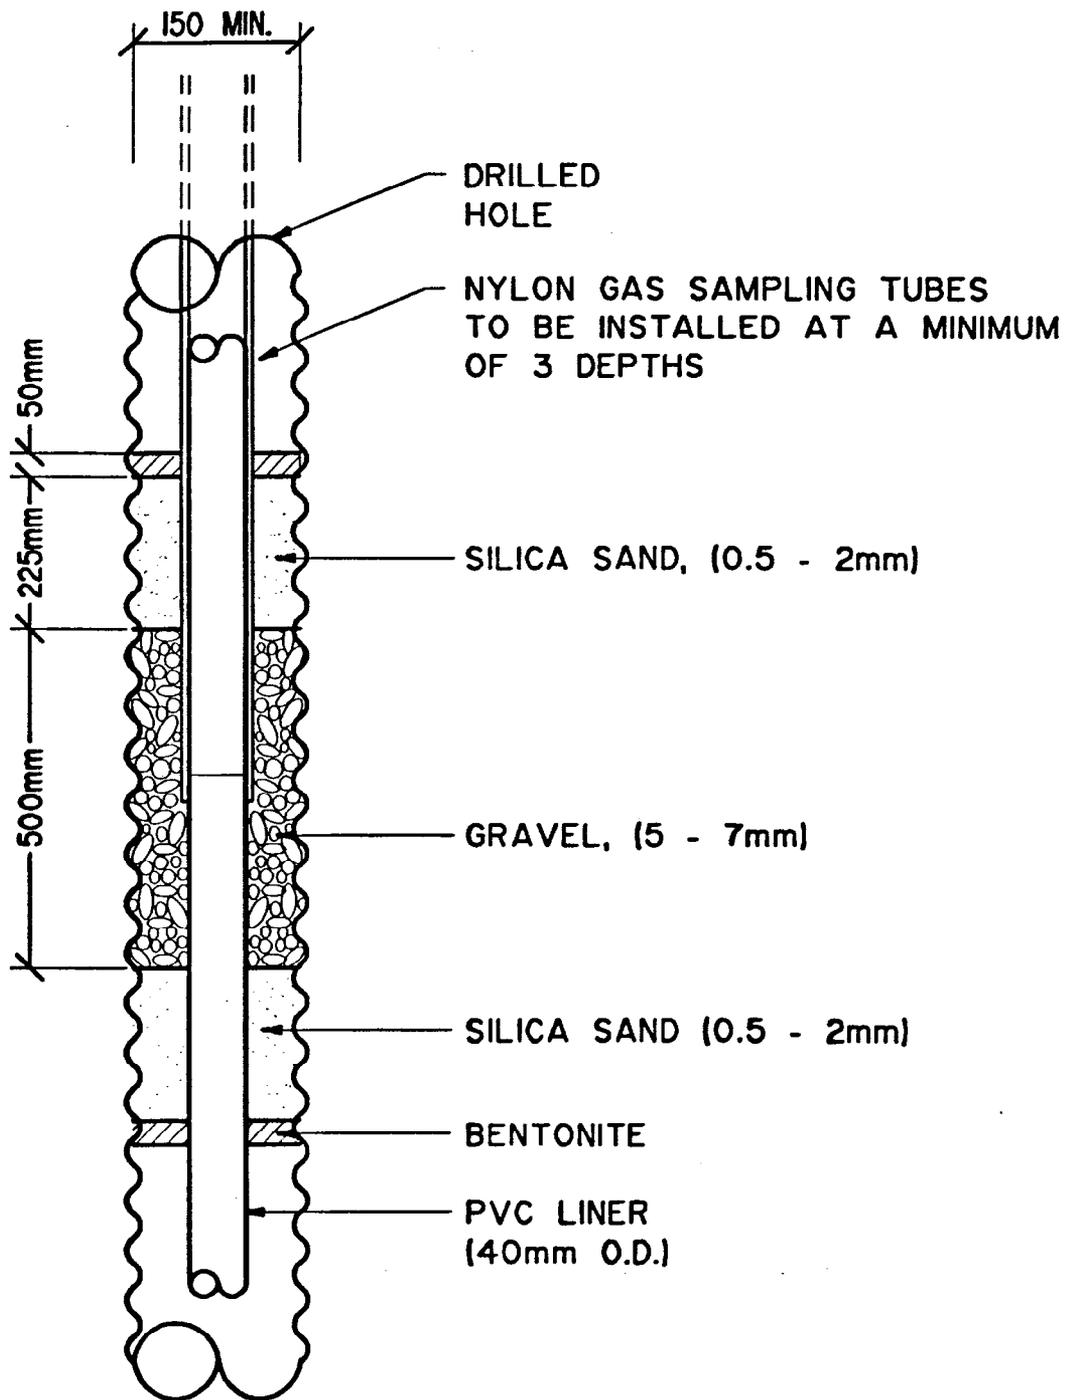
PROBE HOLE LINER SCHEMATIC
